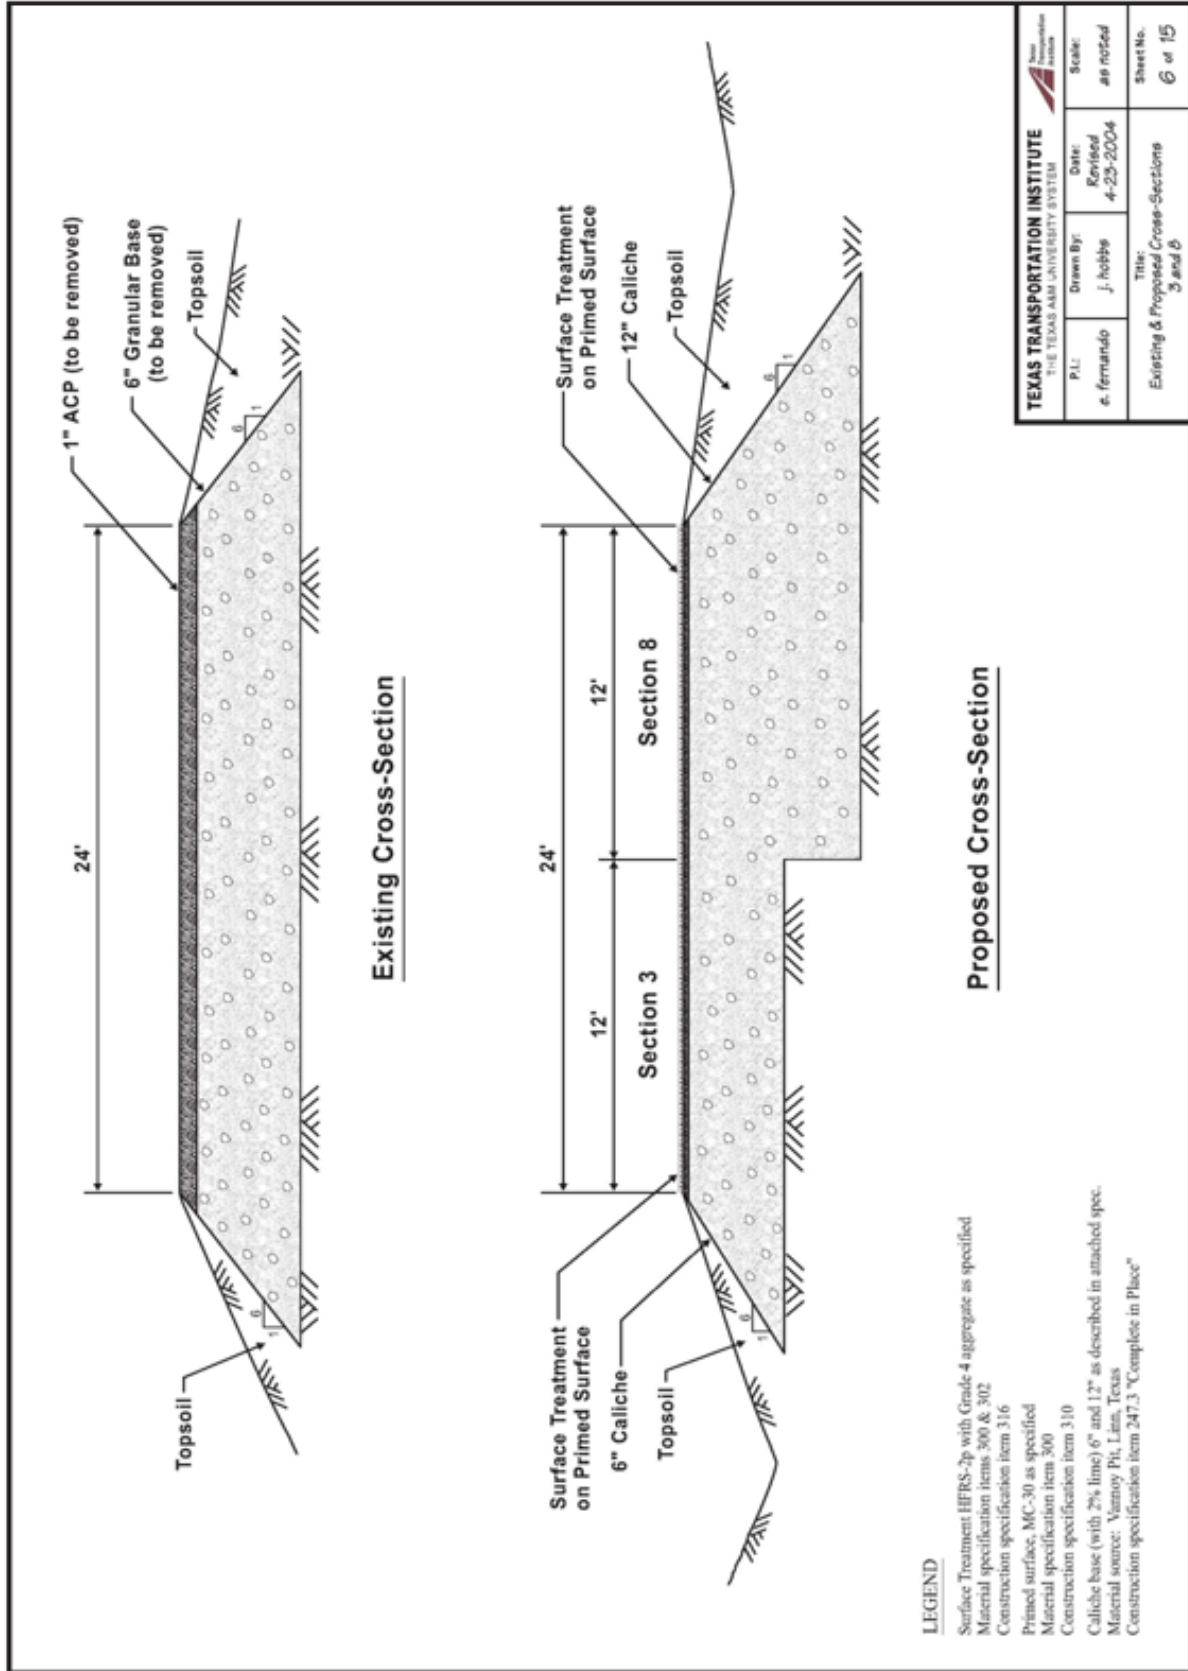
Existing and Proposed Cross-Sections for Sections 3 and 8.
